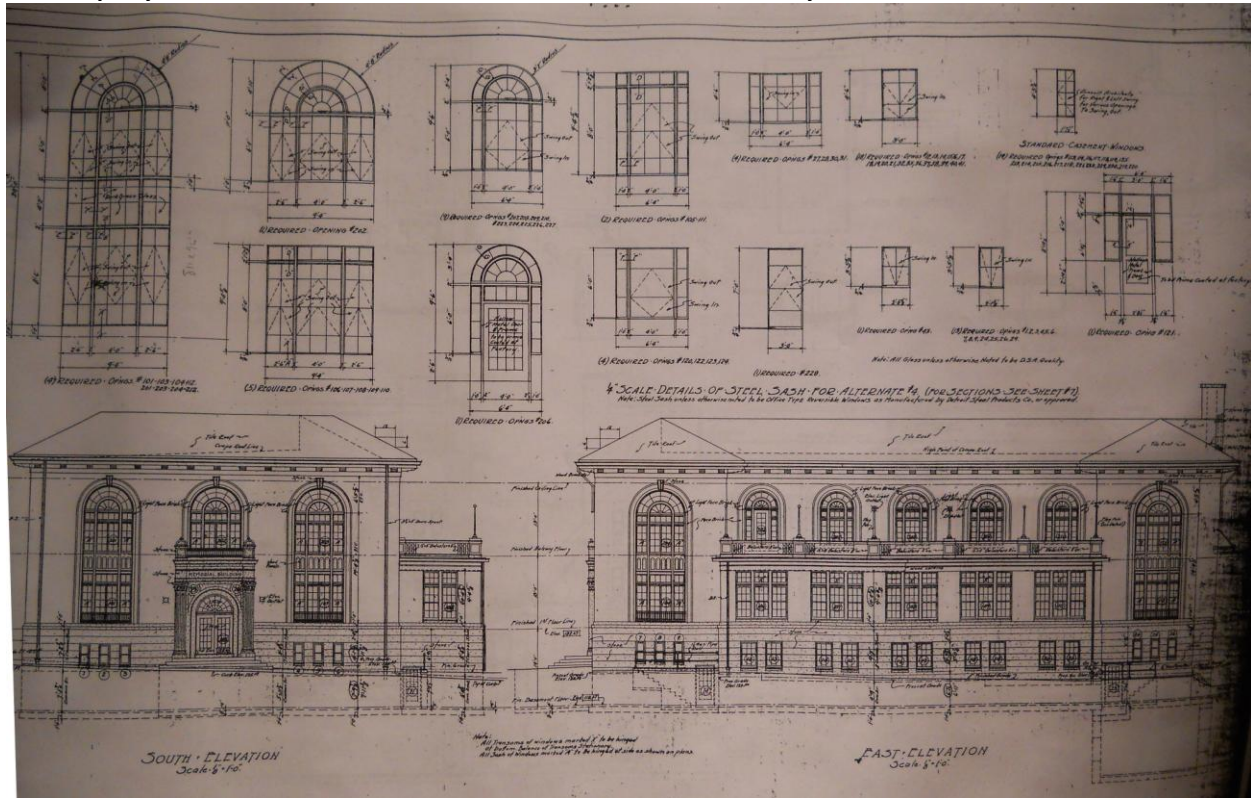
South and east elevations and window details, Memorial Building, 1928.
